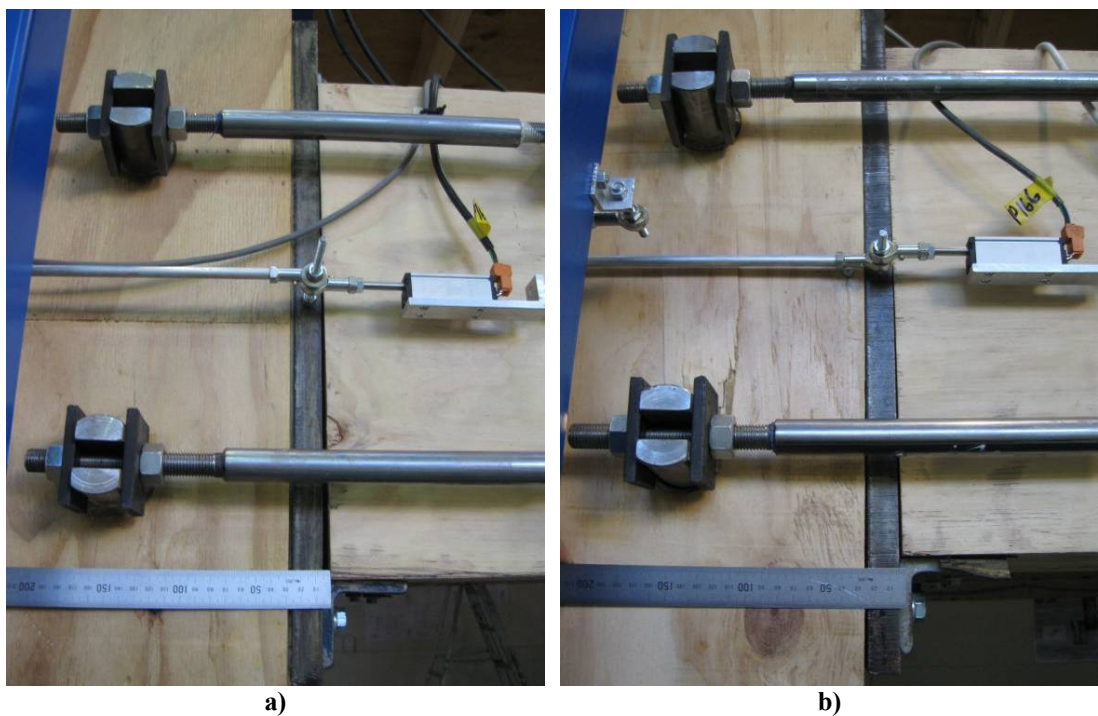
L2 BC connection gap opening at 2% Drift a) SW column b) S column
